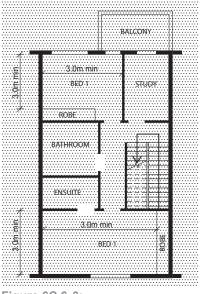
C.6-3: Minimum dimension controls for bedrooms - Level 1
